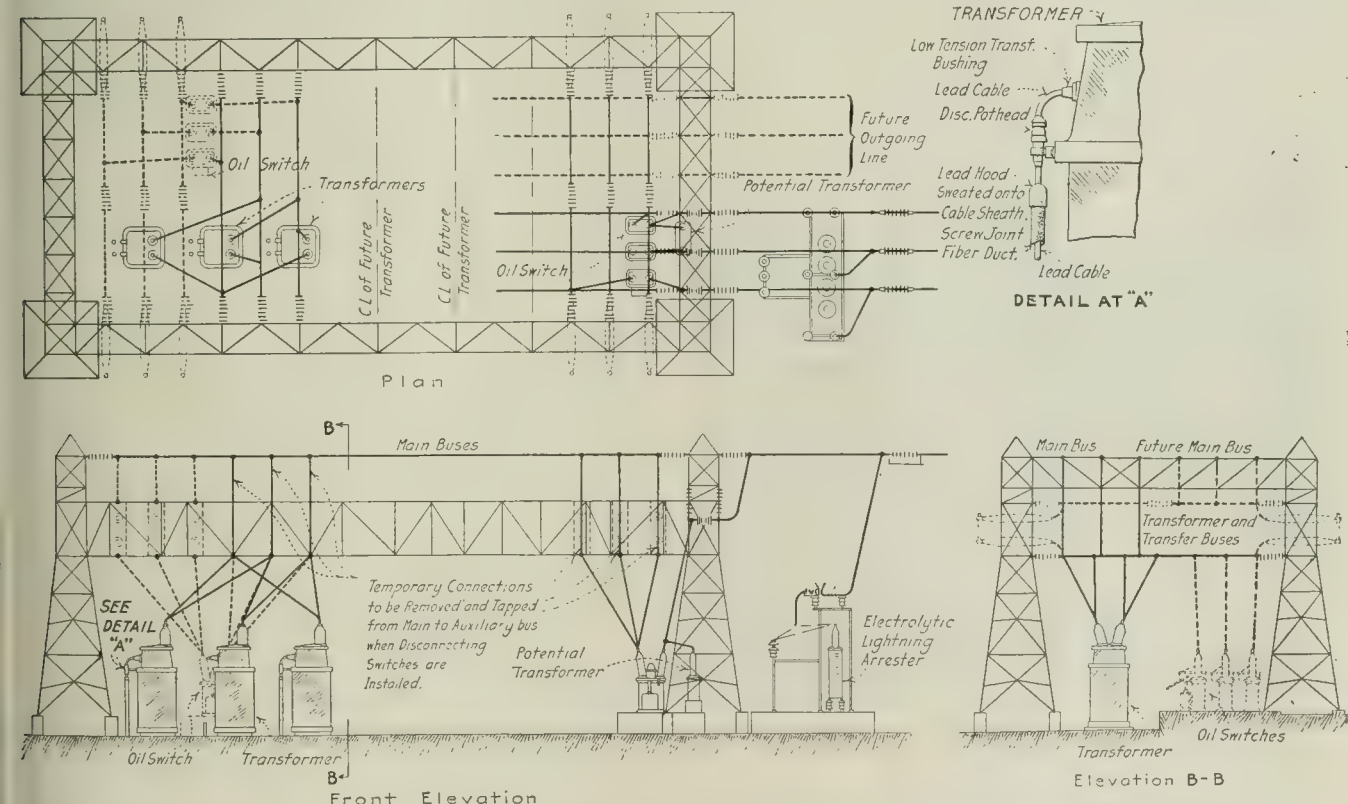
OUTDOOR STATION ARRANGED FOR FUTURE GROWTH AND WHICH WILL BE EQUIPPED WITH POST-TYPE DISCONNECTING SWITCHES
